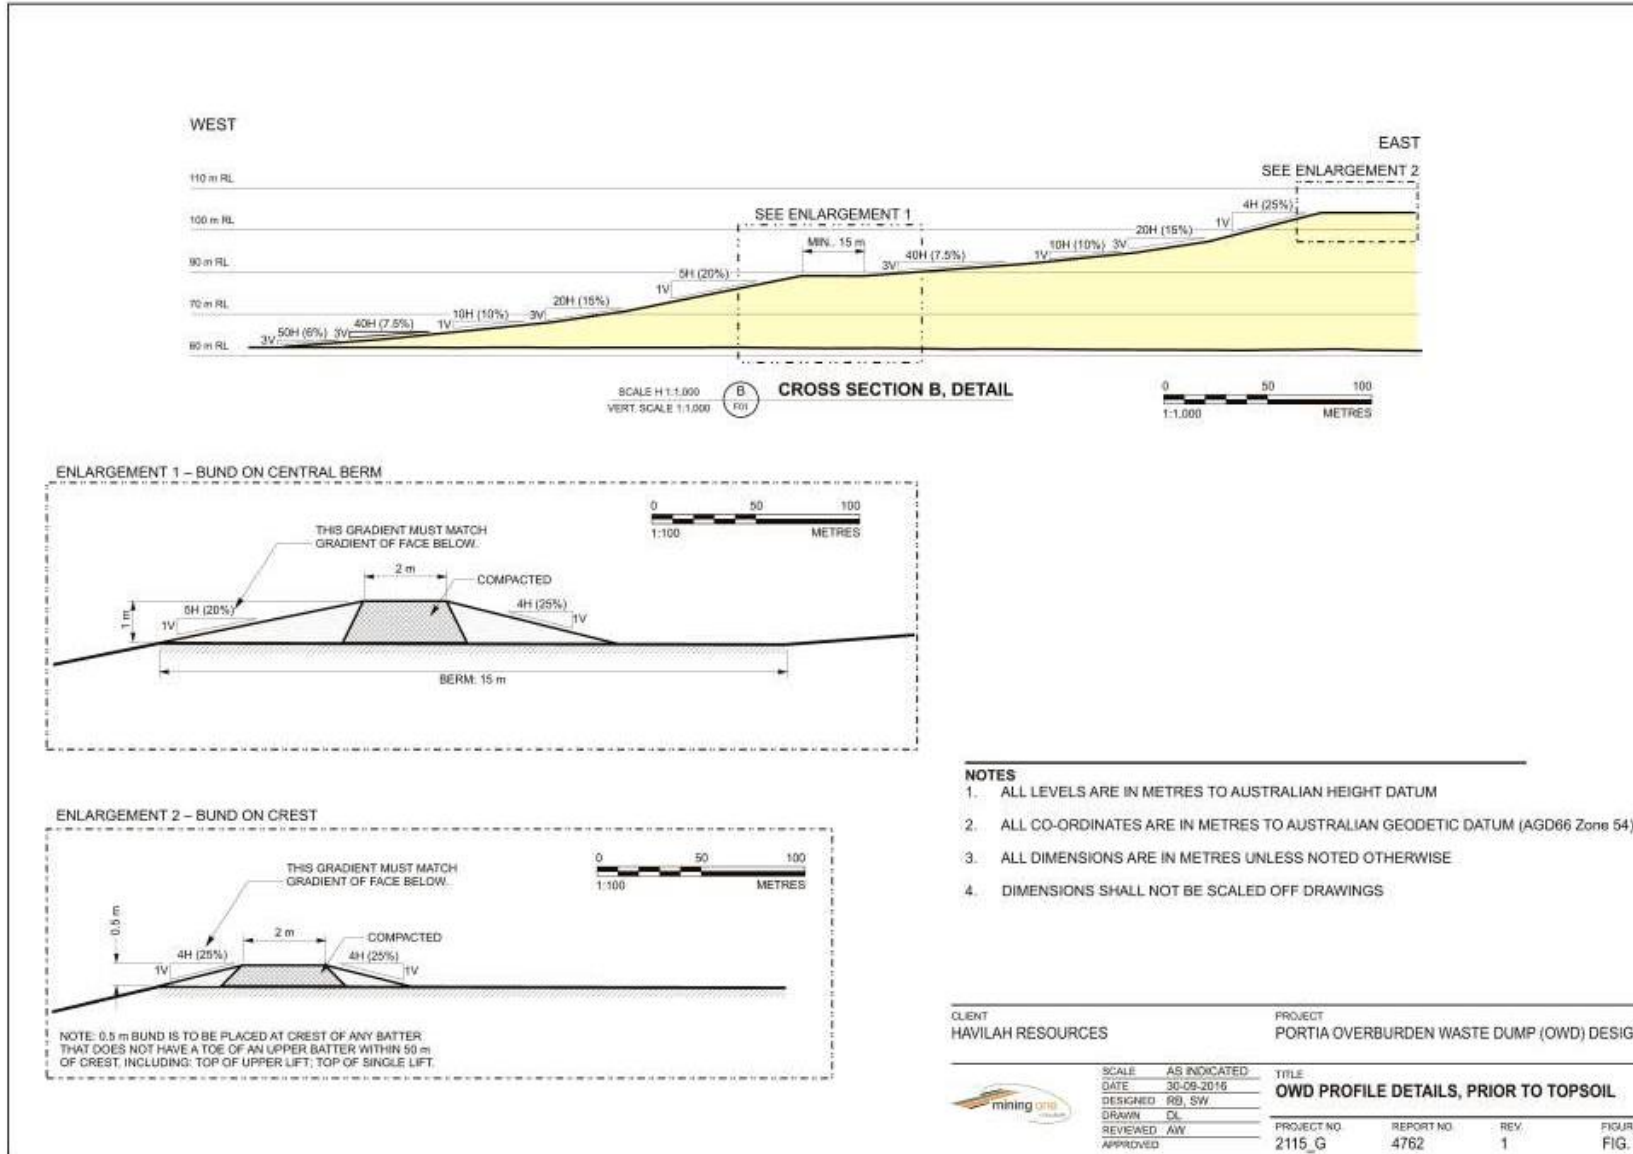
OWD Final Design Profile Details – Prior to Topsoil Cover
